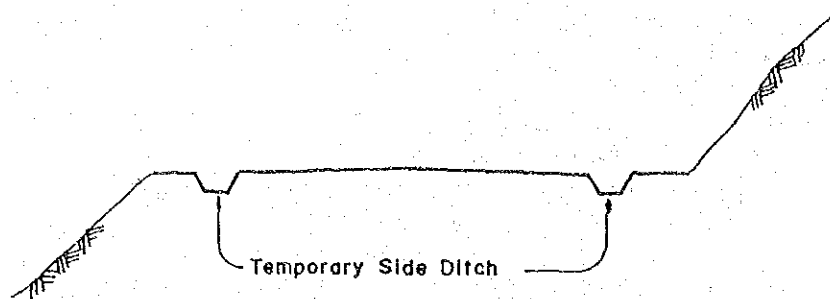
ARRANGEMENT OF TEMPORARY SLOPE DITCH
